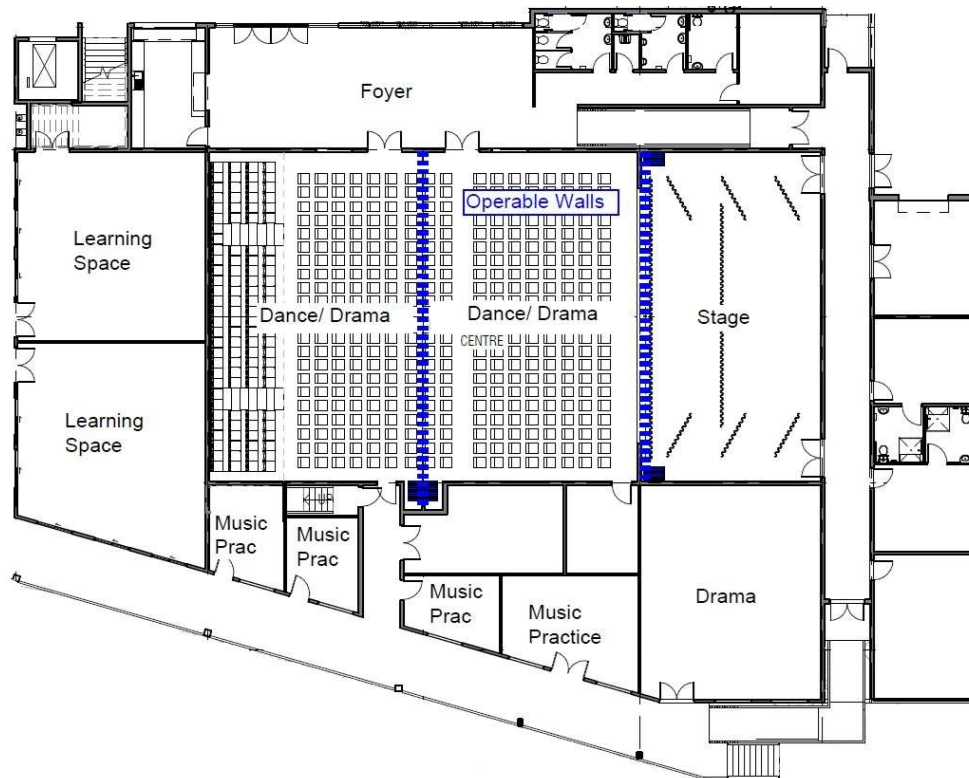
Performing Arts Centre floor plan showing operable walls and music rooms
